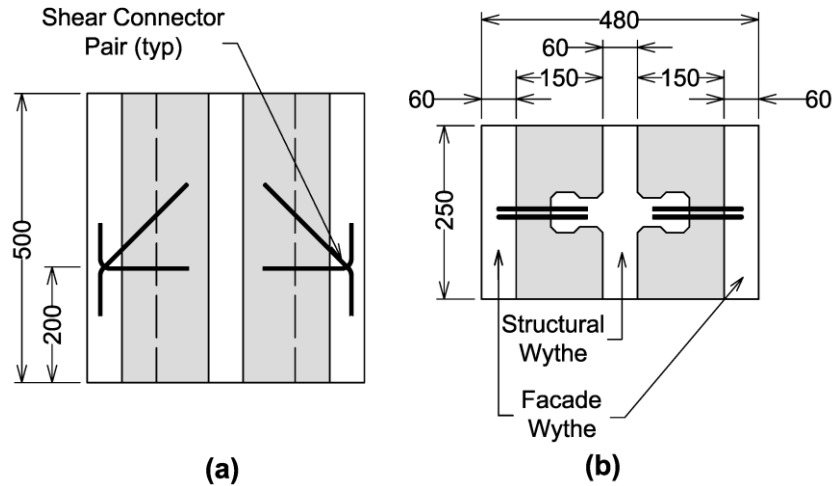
Details for push through test specimens (a) elevation with shear connector location (compression loading shown, flip vertically for tension loading) and (b) Top view showing back-to-back panel configuration for symmetry. All dimensions in mm (100 mm = 3.94 in).
